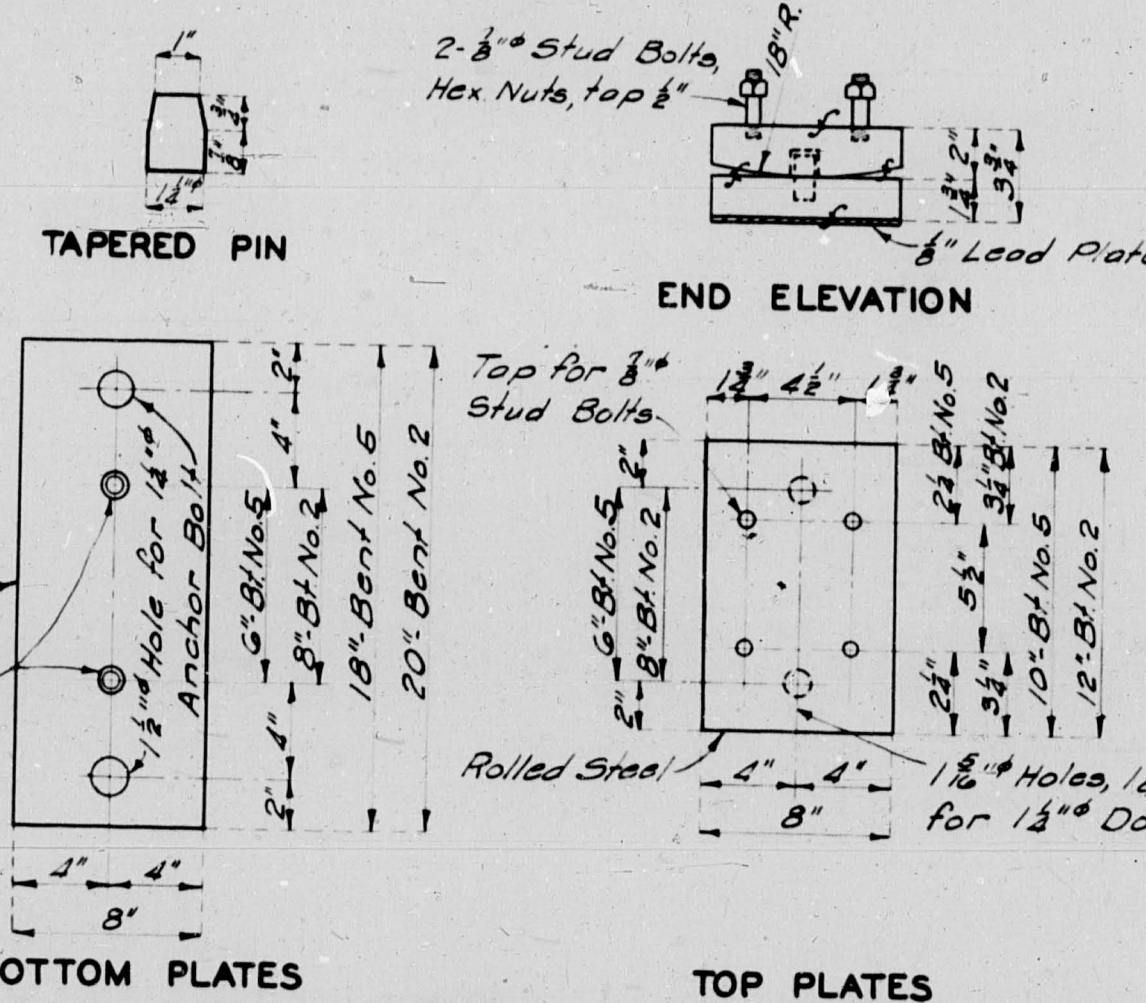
DETAILS OF EXPANSION SHOES FOR TRUSS SPAN
